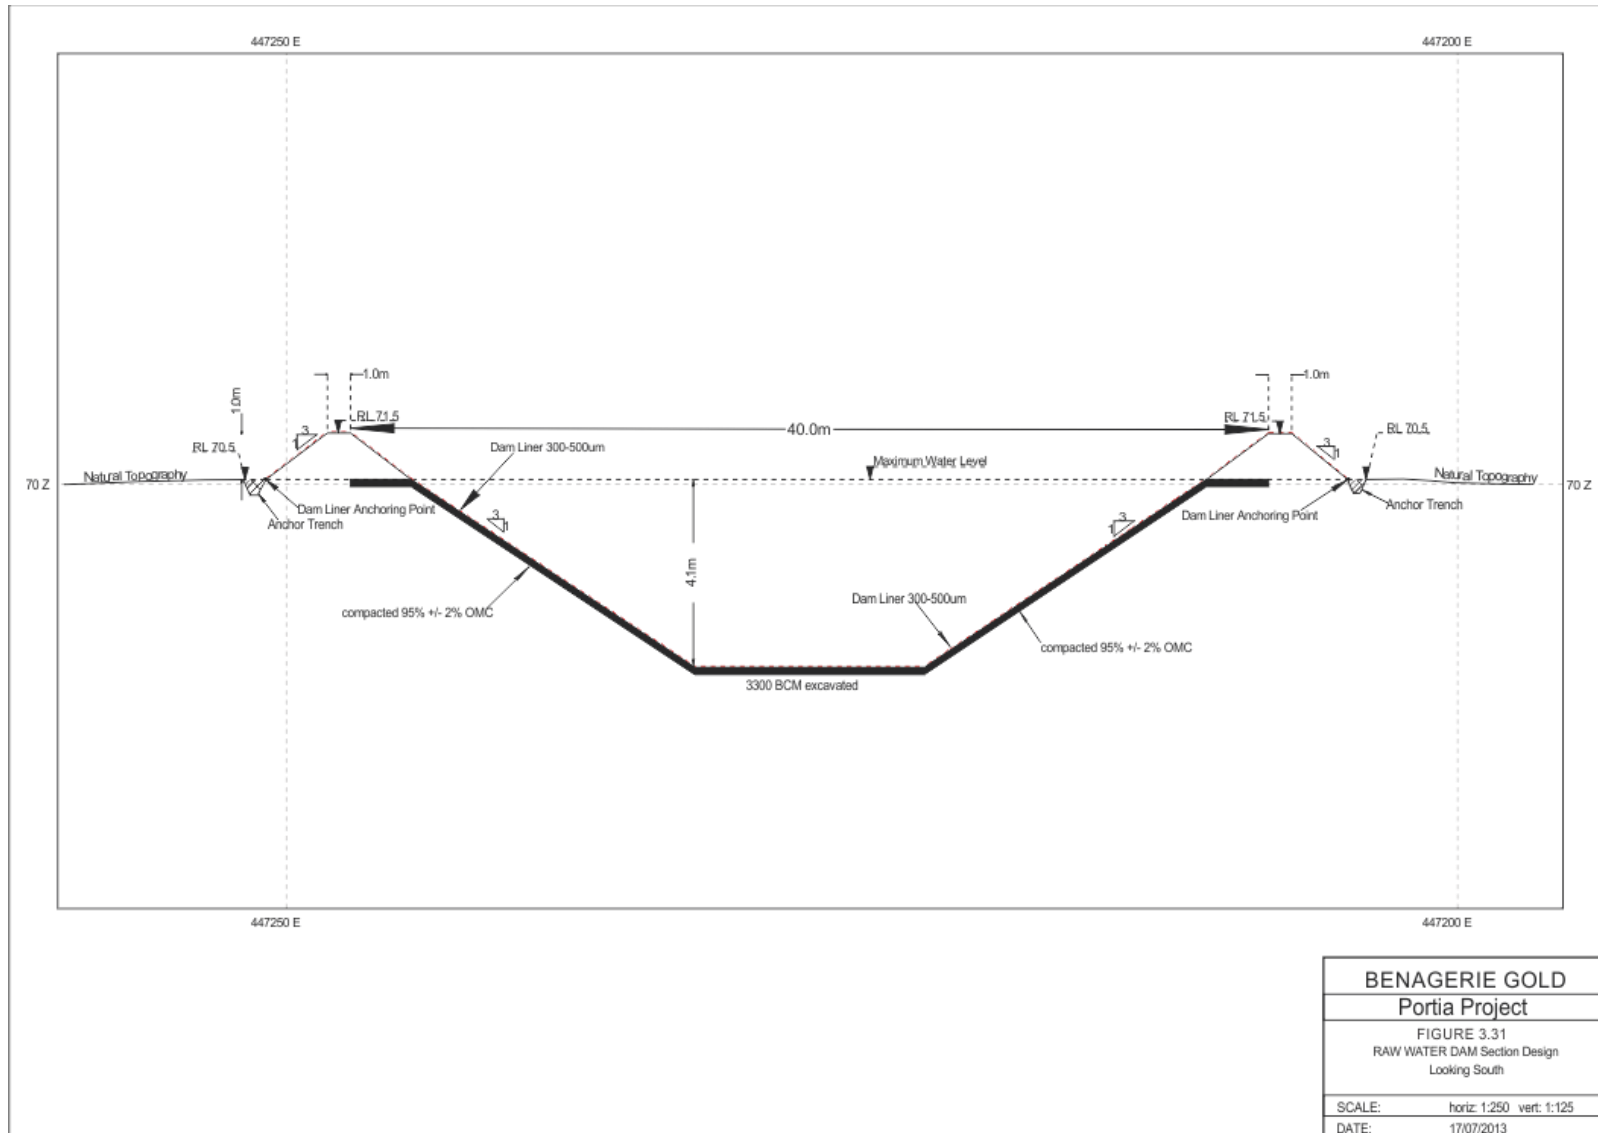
Cross-Section Looking South of Raw Water Dam (Design)
